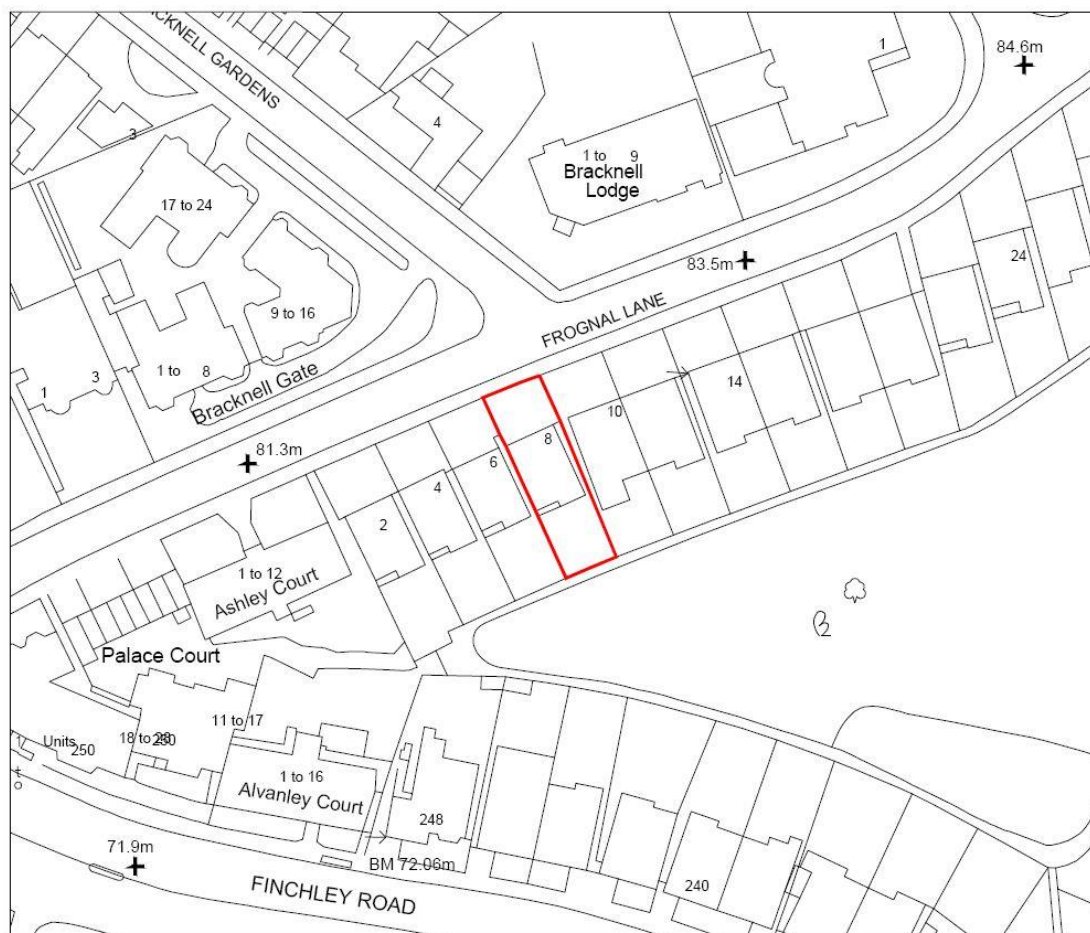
Site Location Plan with application site circled in red (not to scale)
